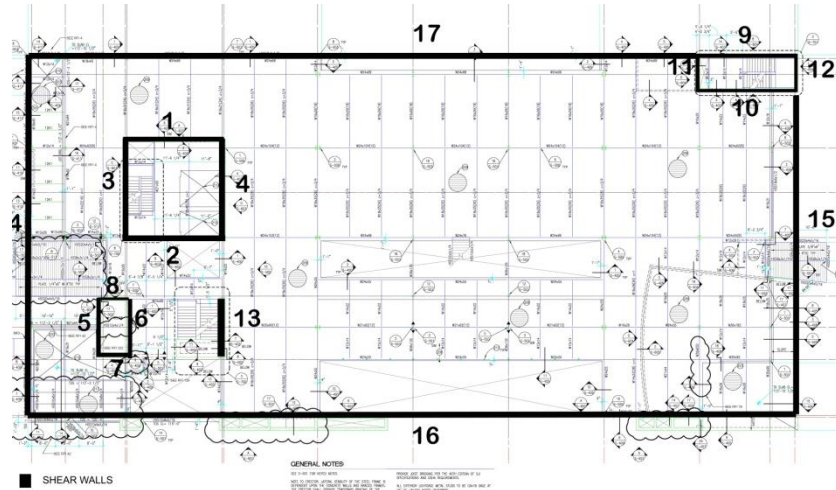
Base Floor Plan indicating Shear Wall Numbers.
